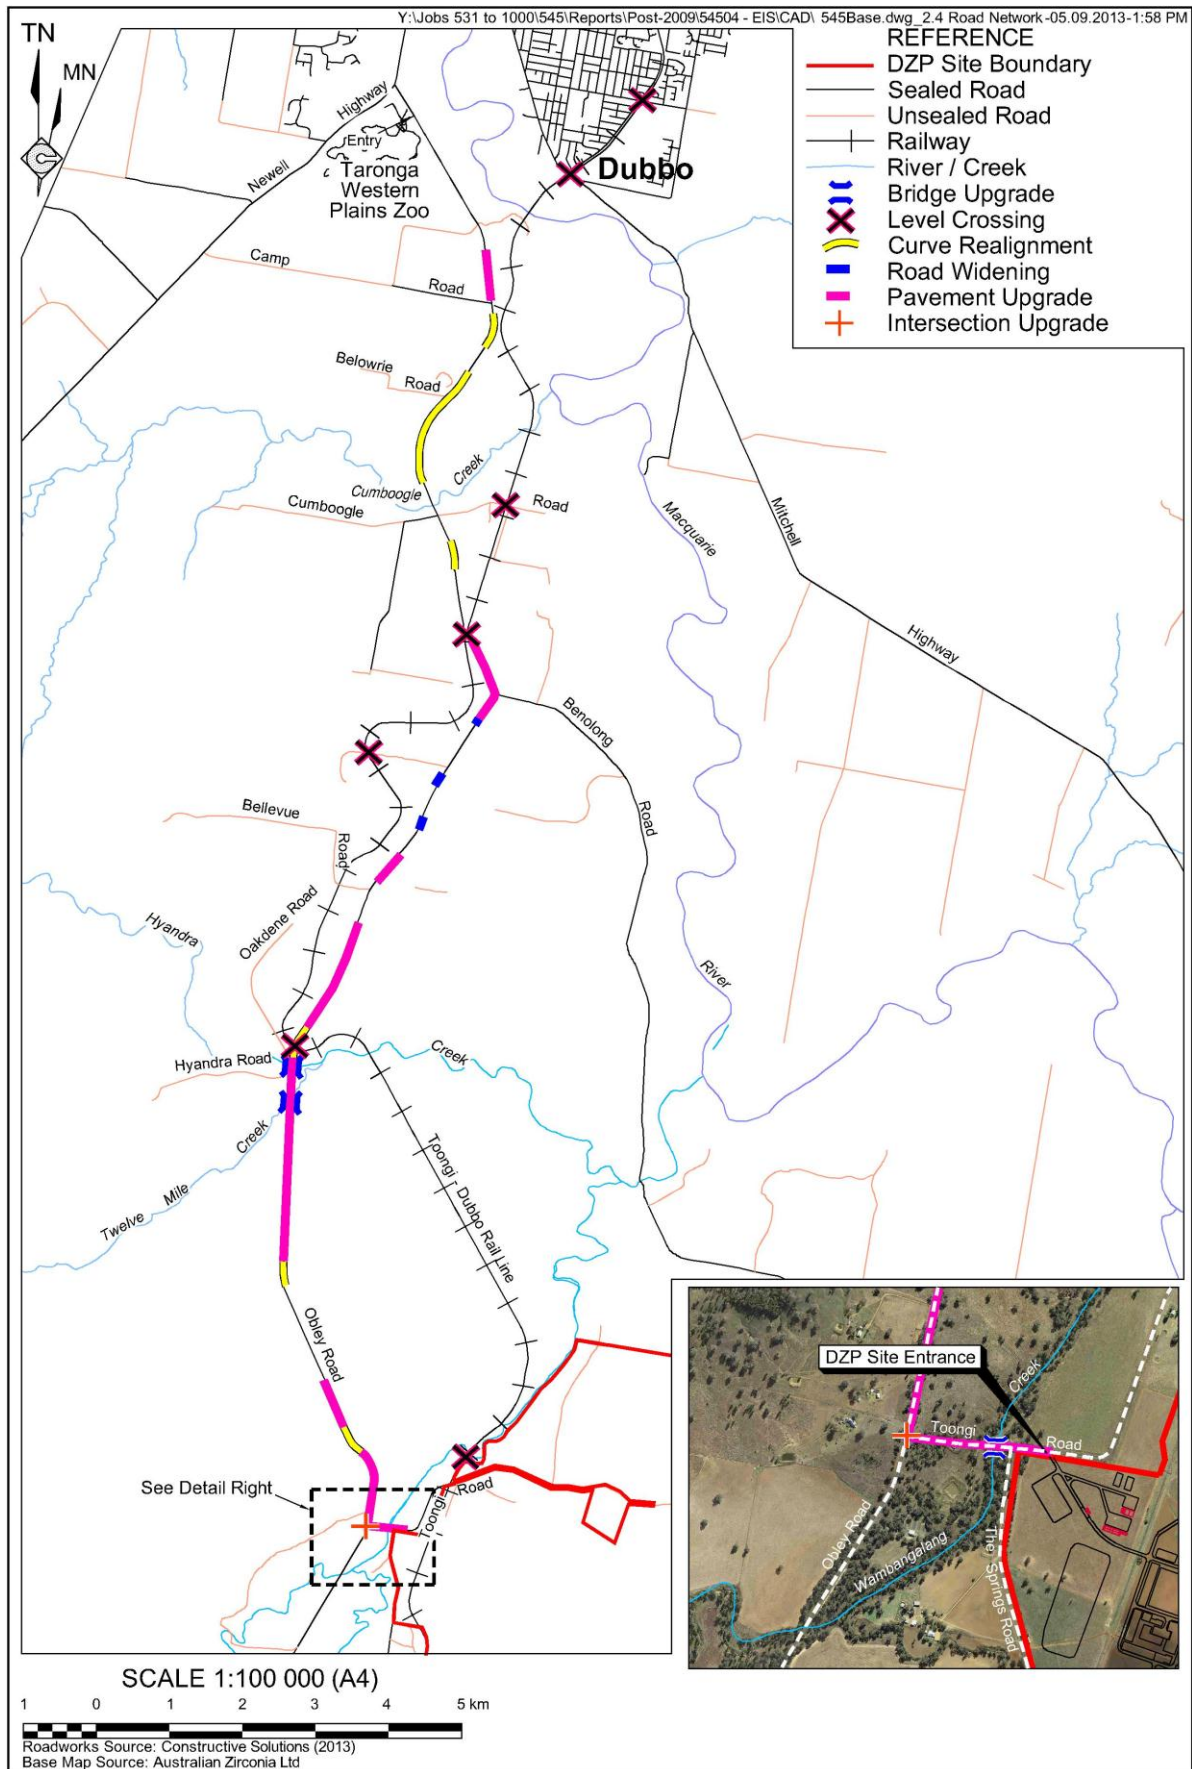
Proposed Upgrades to Obley Road and Toongi Road
